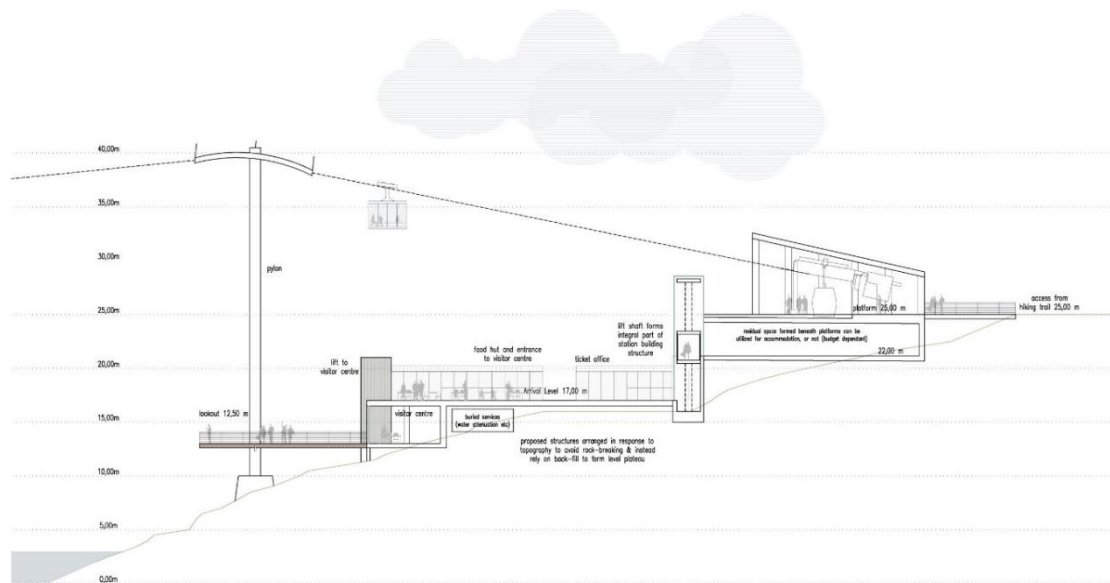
Option 1a architectural section showing the building staggering to follow the landform
